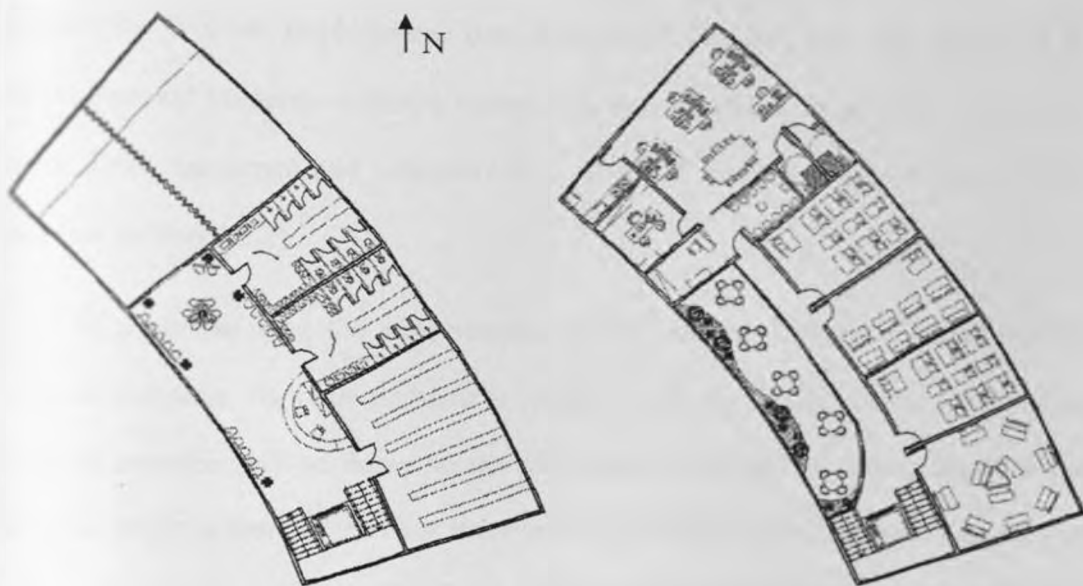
Education building ground and first floor layout plans. Source: Author, 2013.
